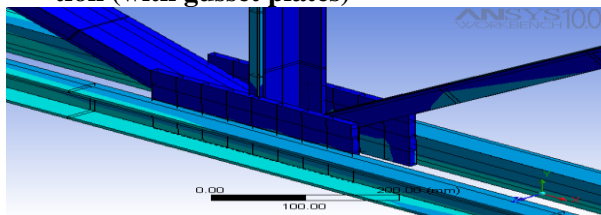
Pitched roof truss with concentric connection (with gusset plates)
